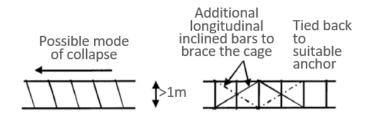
Elevation on beam or deep base showing racking of cage and additional inclined bracing bars to provide stability
